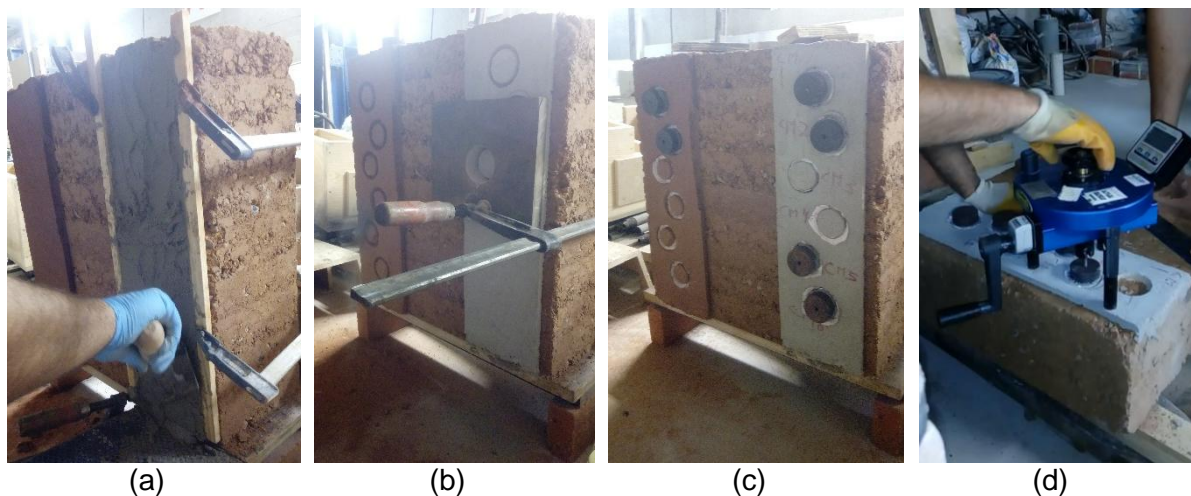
Preparation of pull-off test (a) rendering of mortars; (b) drilling of holes with clamp support; (c) gluing of pull heads on test specimens with adhesive and (d) fixing of apparatus on pull heads
